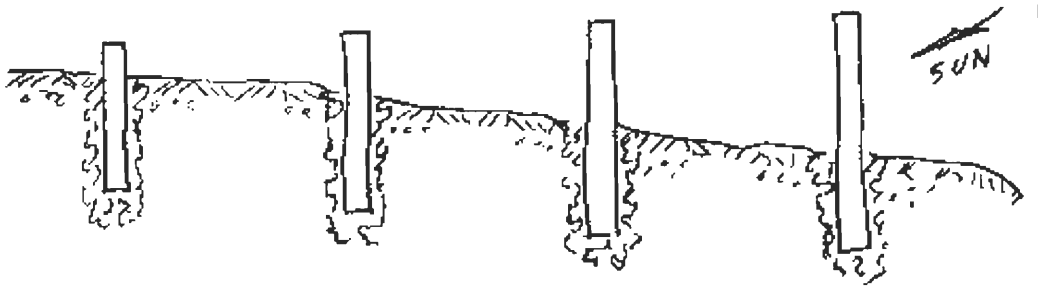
Post footing formed with wooden posts set in concrete. (Roberts, 130)
